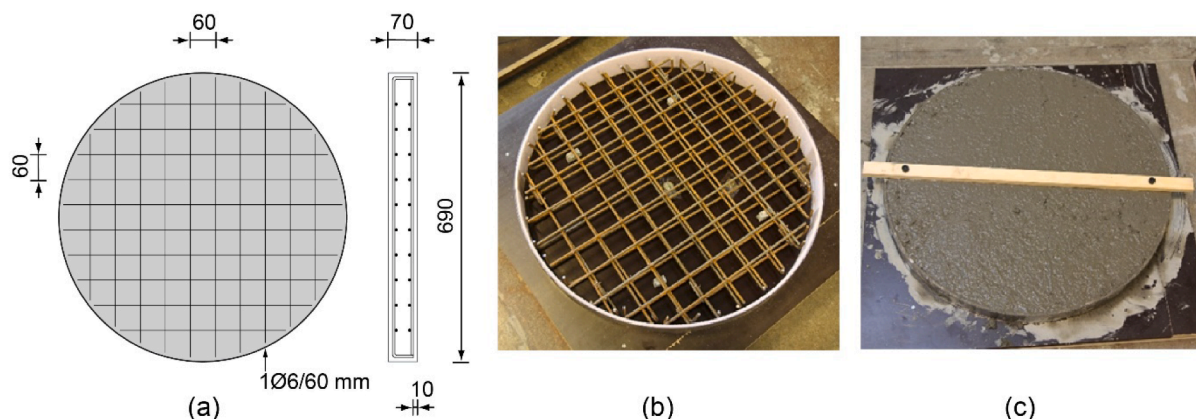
Reinforced concrete slab specimen: (a) specimen size, (b) mould used to cast the slab and (c) view of the cast slab (units: mm).
